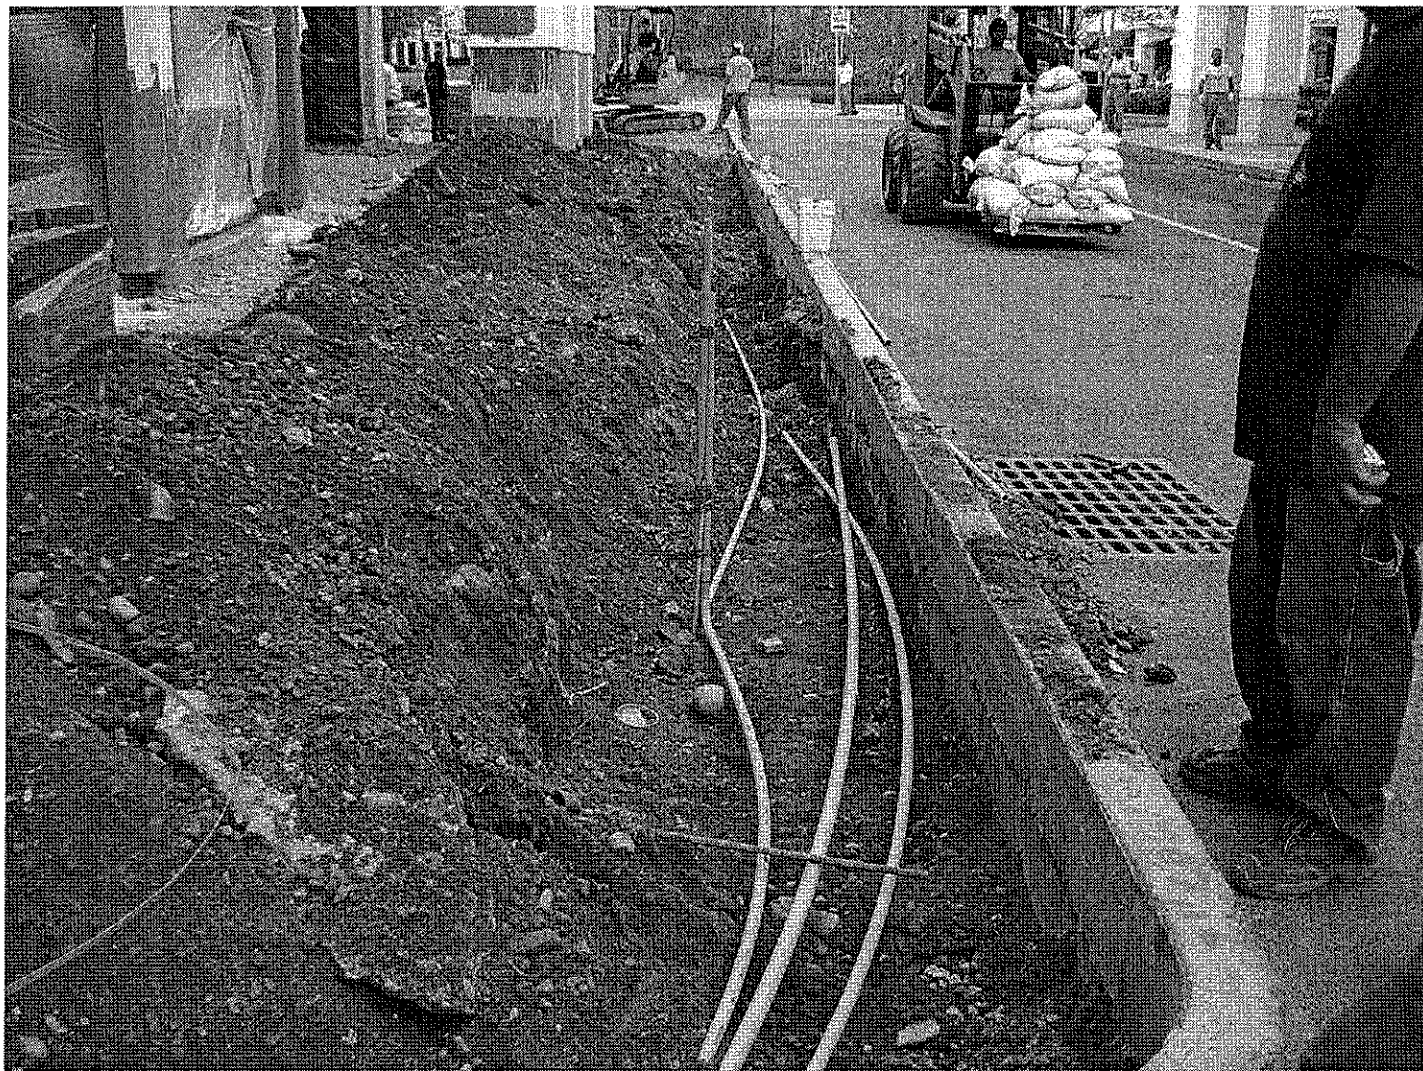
Electric piping for Light Poles South of building 3 sidewalk
